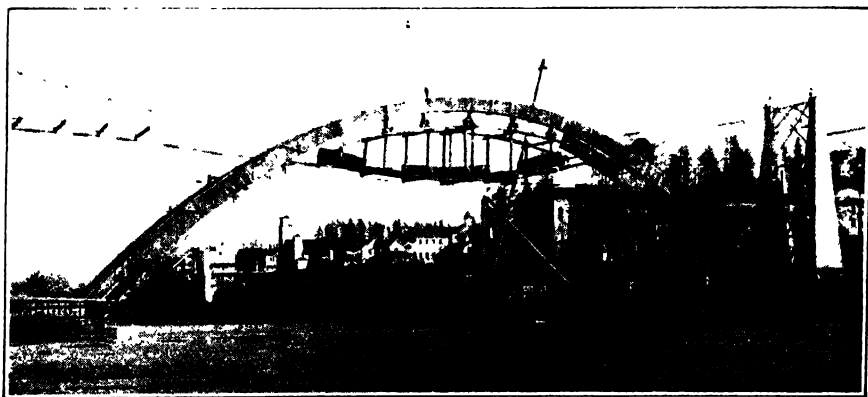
Suspended centering for steel arch rib—Oregon City Bridge over Willamette River.
